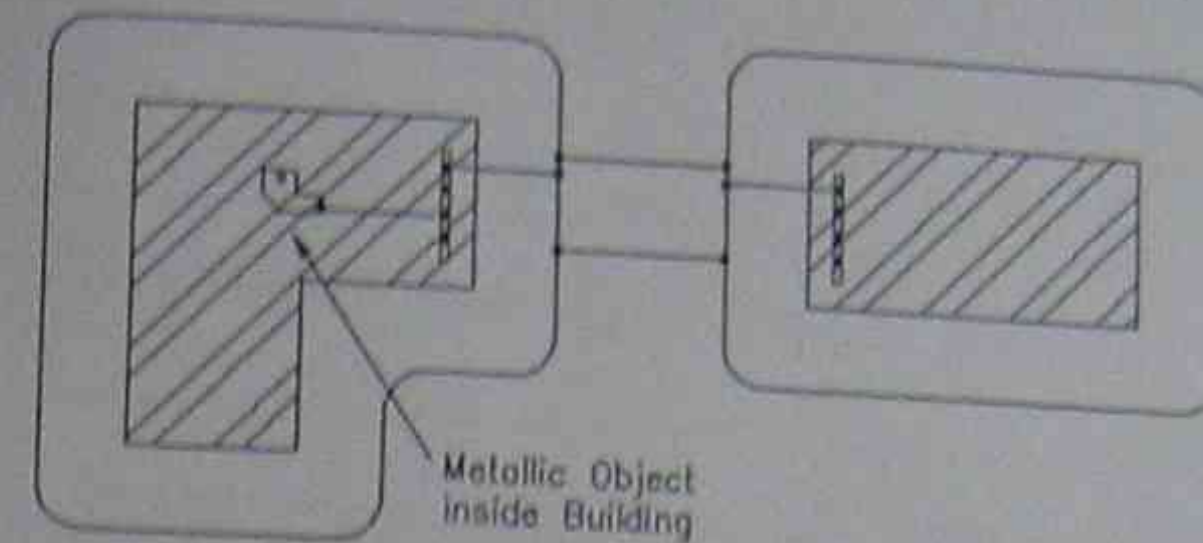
Bonding of Metallic Objects Inside a Building to the Bonding Bar
